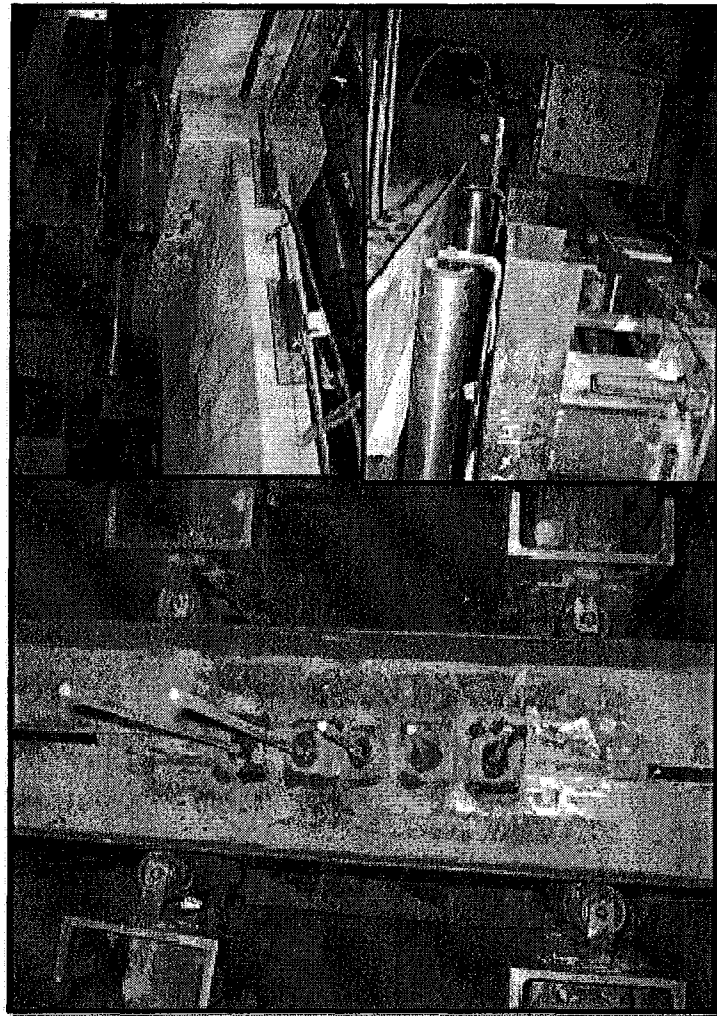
The Steel Loading Beam at Top of Shear Wall
